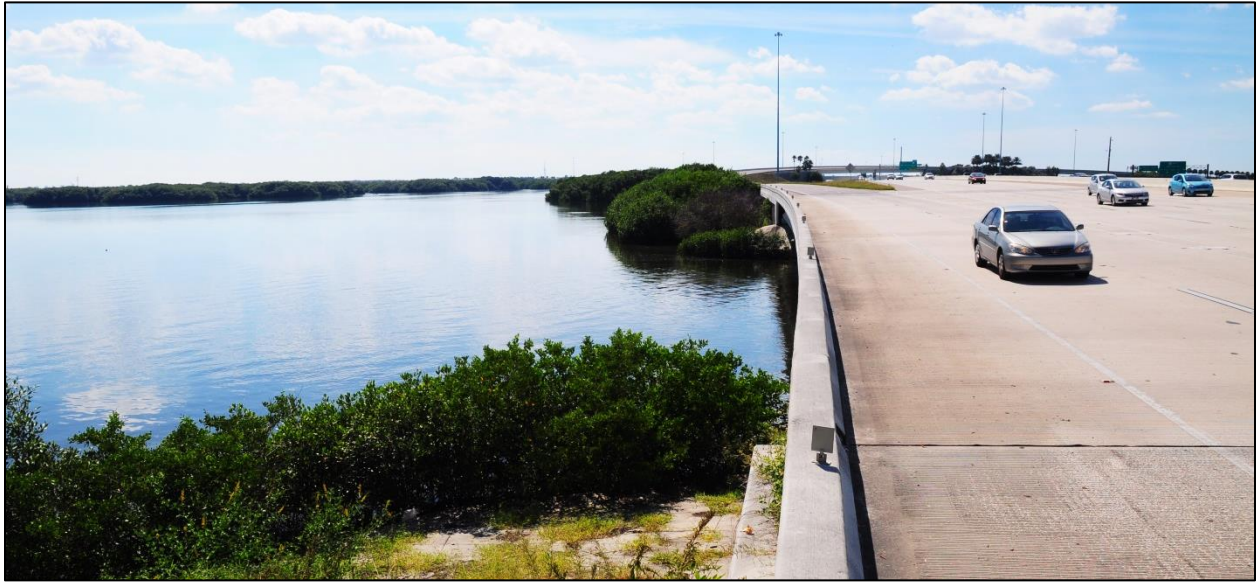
Aerial view of I-275 bridge (#150252) over Big Island Gap
